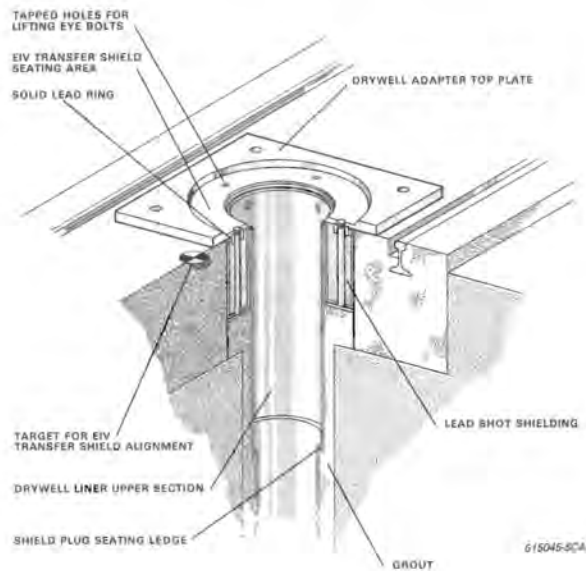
Drywell Shield Adapter Configuration (Shown Installed in Drywell)
